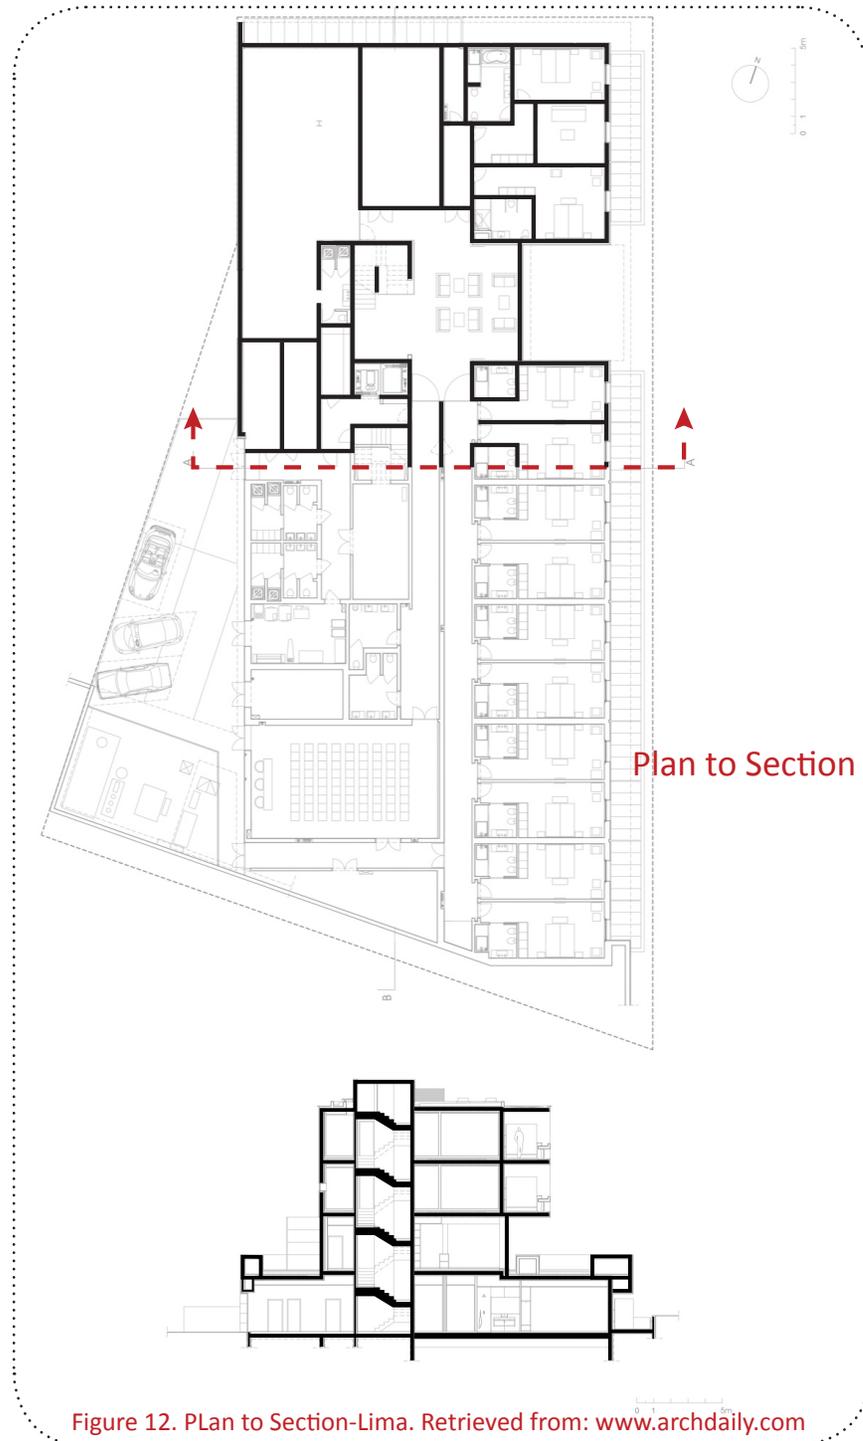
Plan to Section-Lima. Retrieved from: www.archdaily.com
